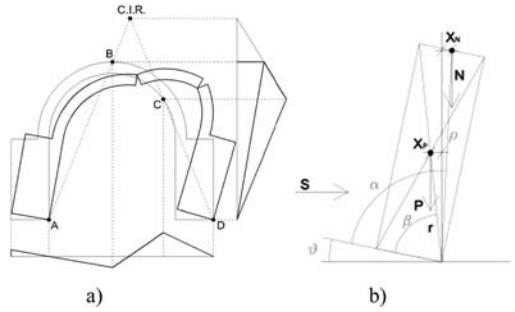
Collapse mechanisms: a) Arch and abutment global mechanism in longitudinal direction for arches with tall abutments b) spandrel wall out of plane overturning.
